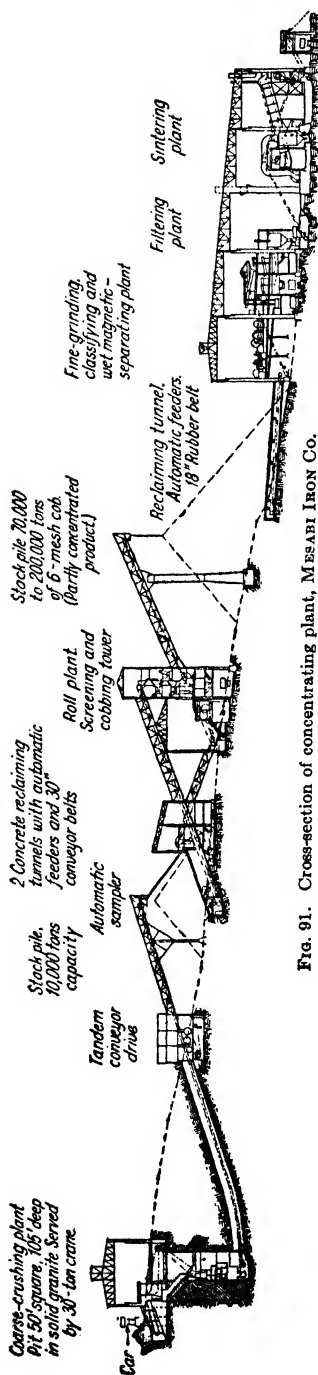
Cross-section of concentrating plant, MESABI IRON CO.
